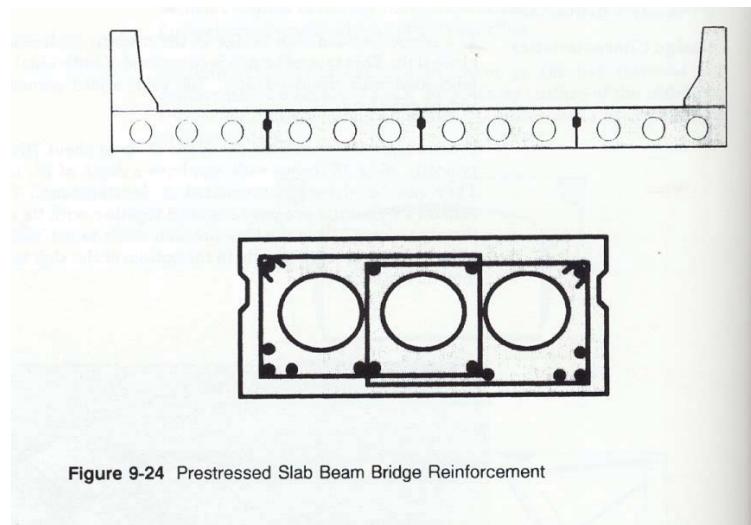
Prestressed Slab Beam Bridge Reinforcement
